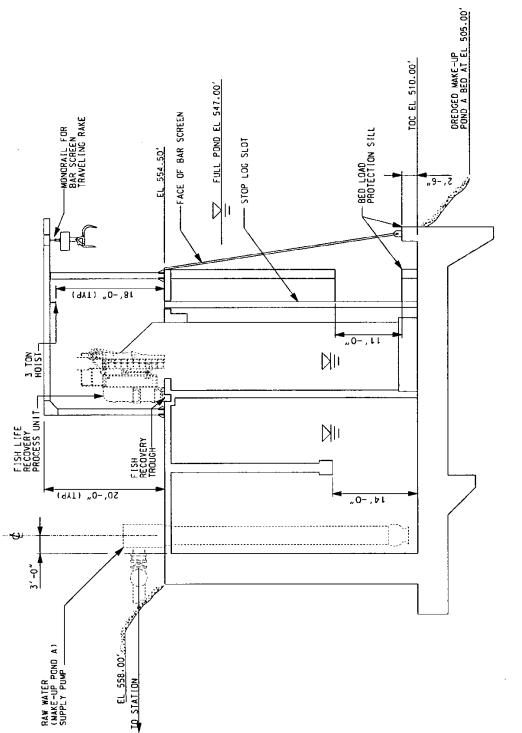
Cross-Section View of the Make-Up Pond A Intake Structure (Duke 2011d)
